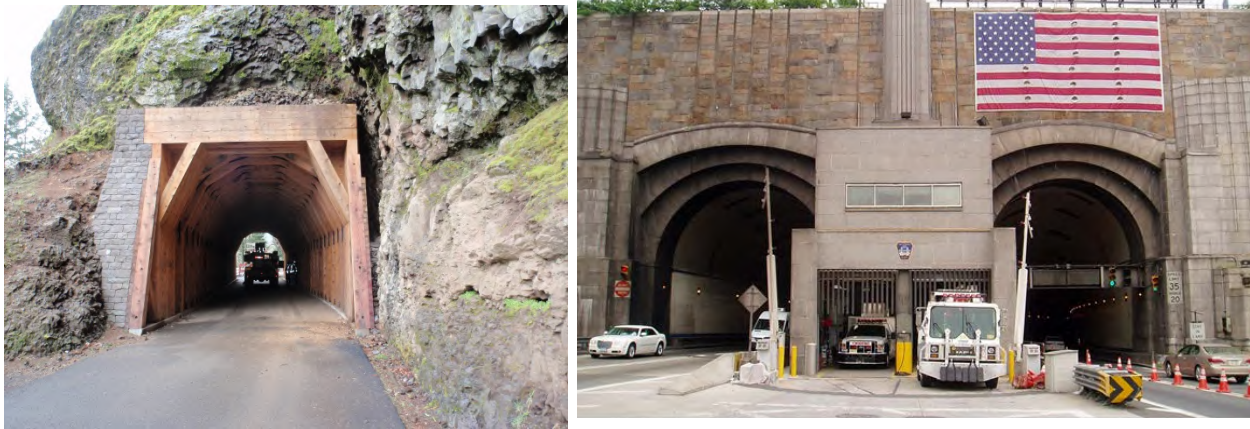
Tunnel portals range from simple (left) to complex (right) structures.
